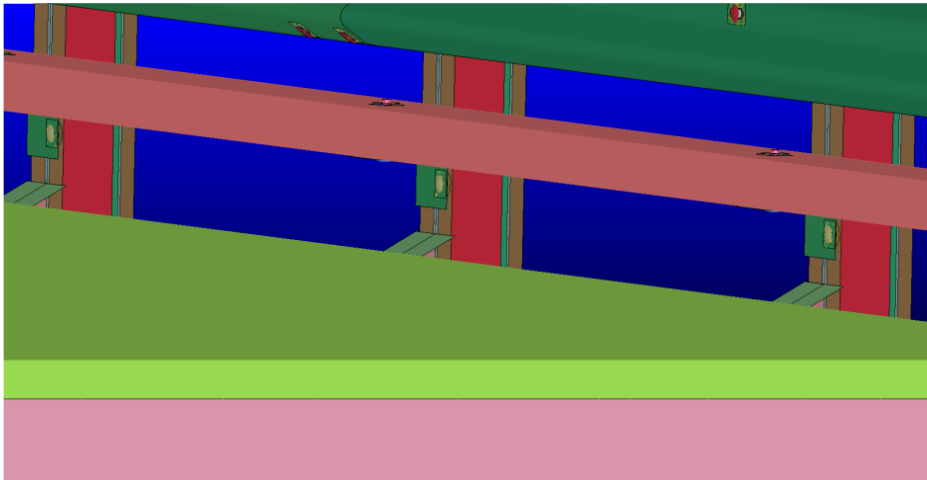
Close up on setup showing lower box rail (rub rail) with pavement
